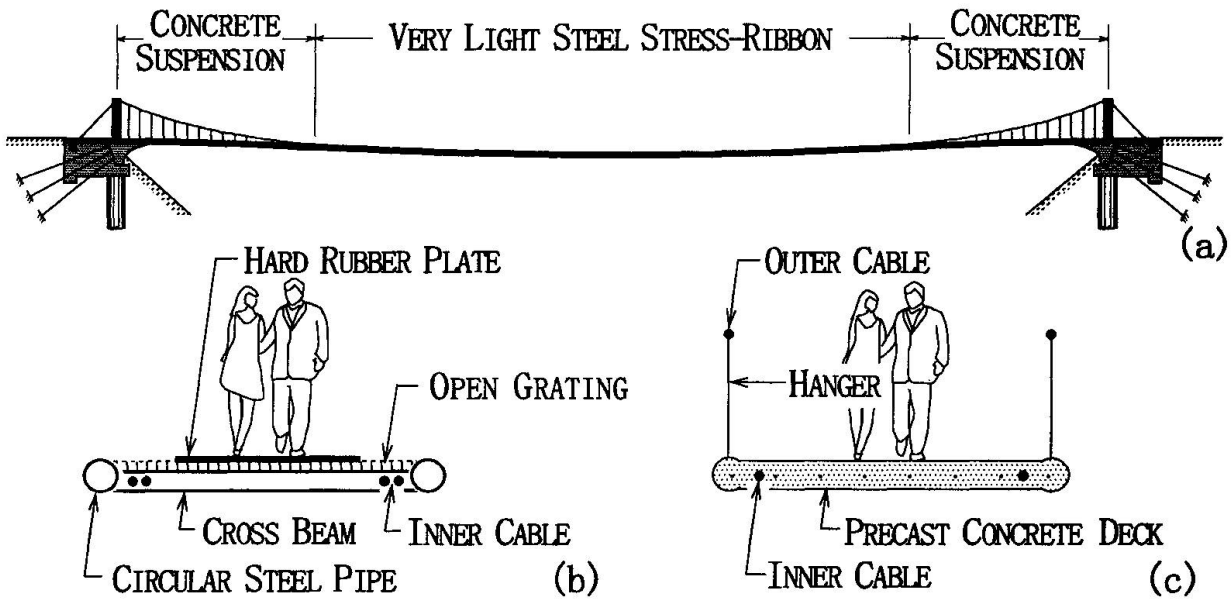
The proposed hybrid stress-ribbon pedestrian bridge. The elevation (a); the cross-section of the central portion of steel stress-ribbon deck (b); that of concrete suspension deck close to the abutment (c).
